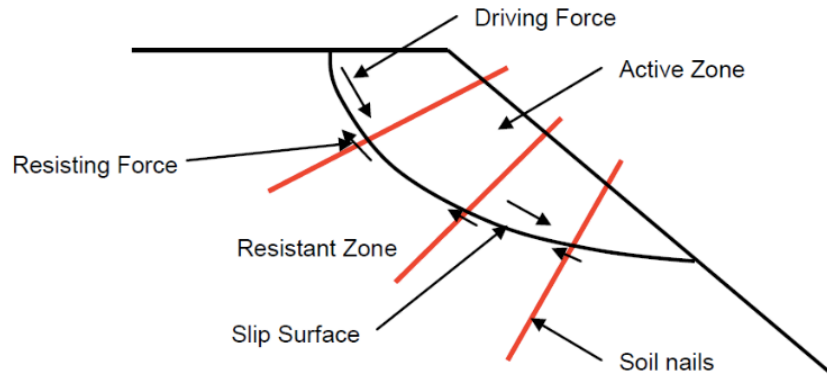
5 Launched Soil Nail in slope stabilization (Titi and Helwany, 2007)
